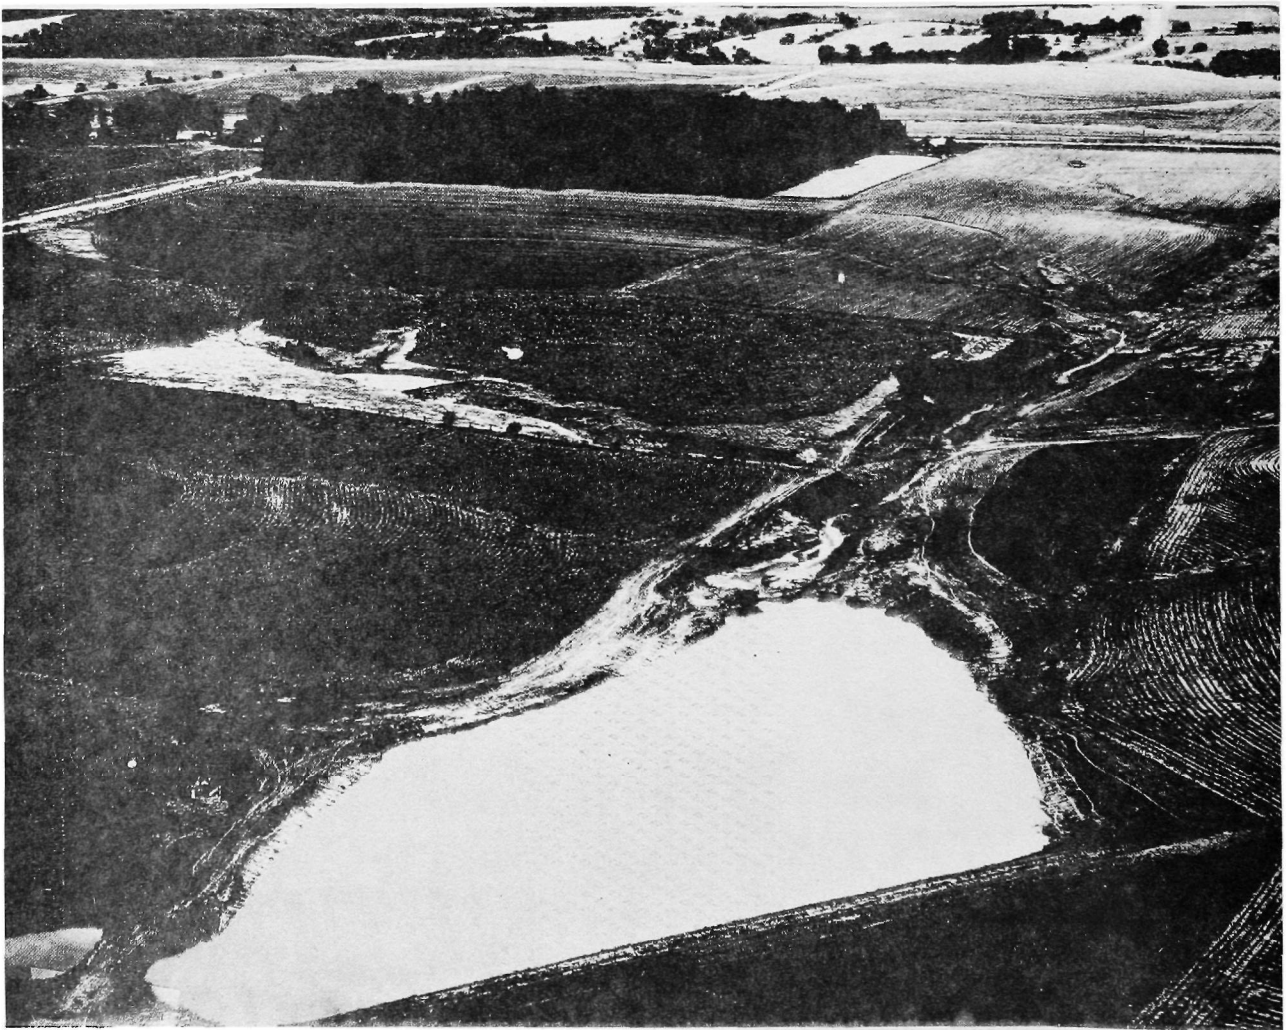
Water Retention Structure Traps Sediment Eroded From Drainage Area Where Terraces, Contour Farming, and Grade Stabilization Structures Have Been Applied.
